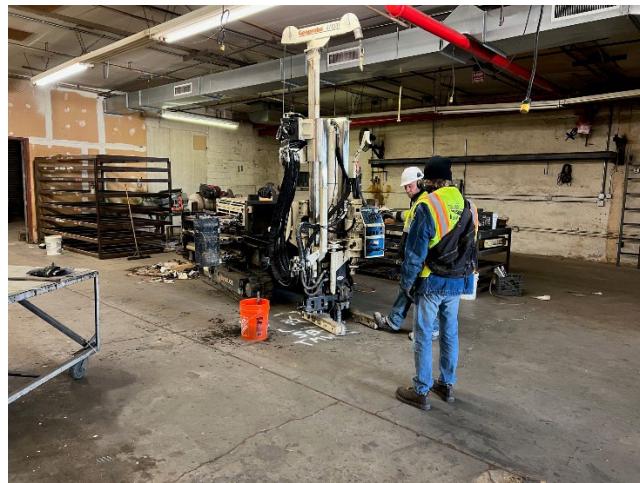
Drilling at SB-2/TMW-2 in the center of the Building.
